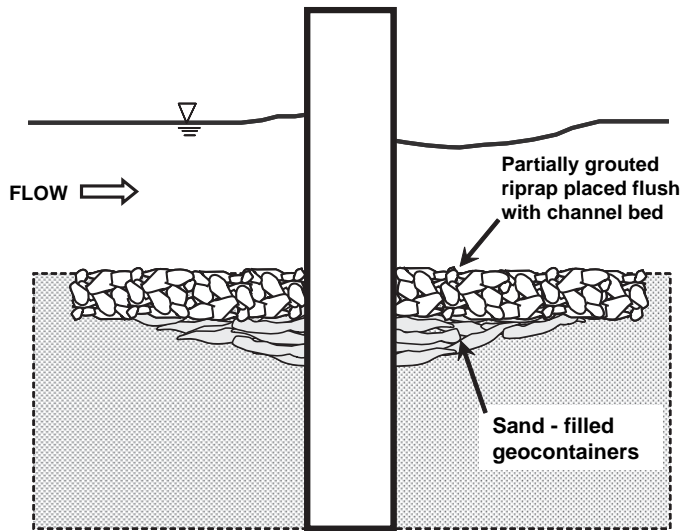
Partially grouted riprap layout diagram for pier scour countermeasures.
